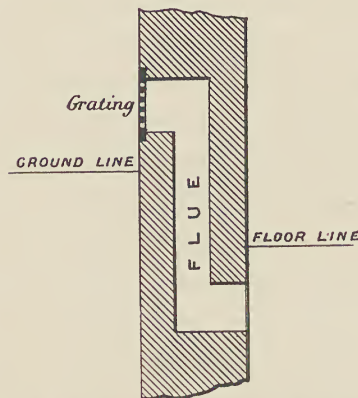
Air-flue for Ventilating Floor below Ground.
